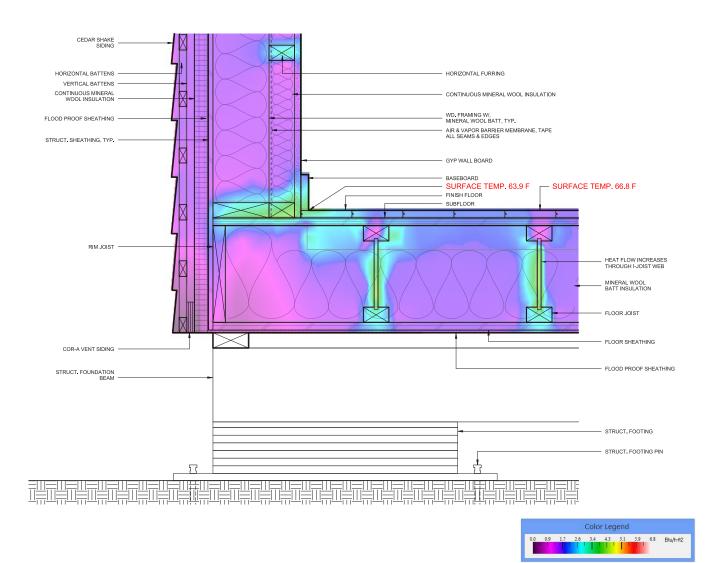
A-7: FLOOR/WALL HEAT FLOW
